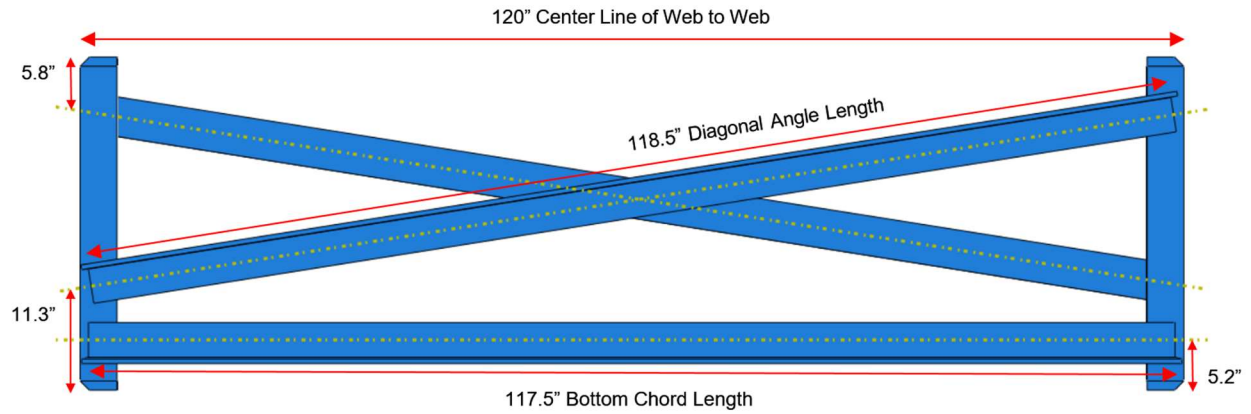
Skewed-staggered cross-frame angle member framing dimensions as studied in Part 3
